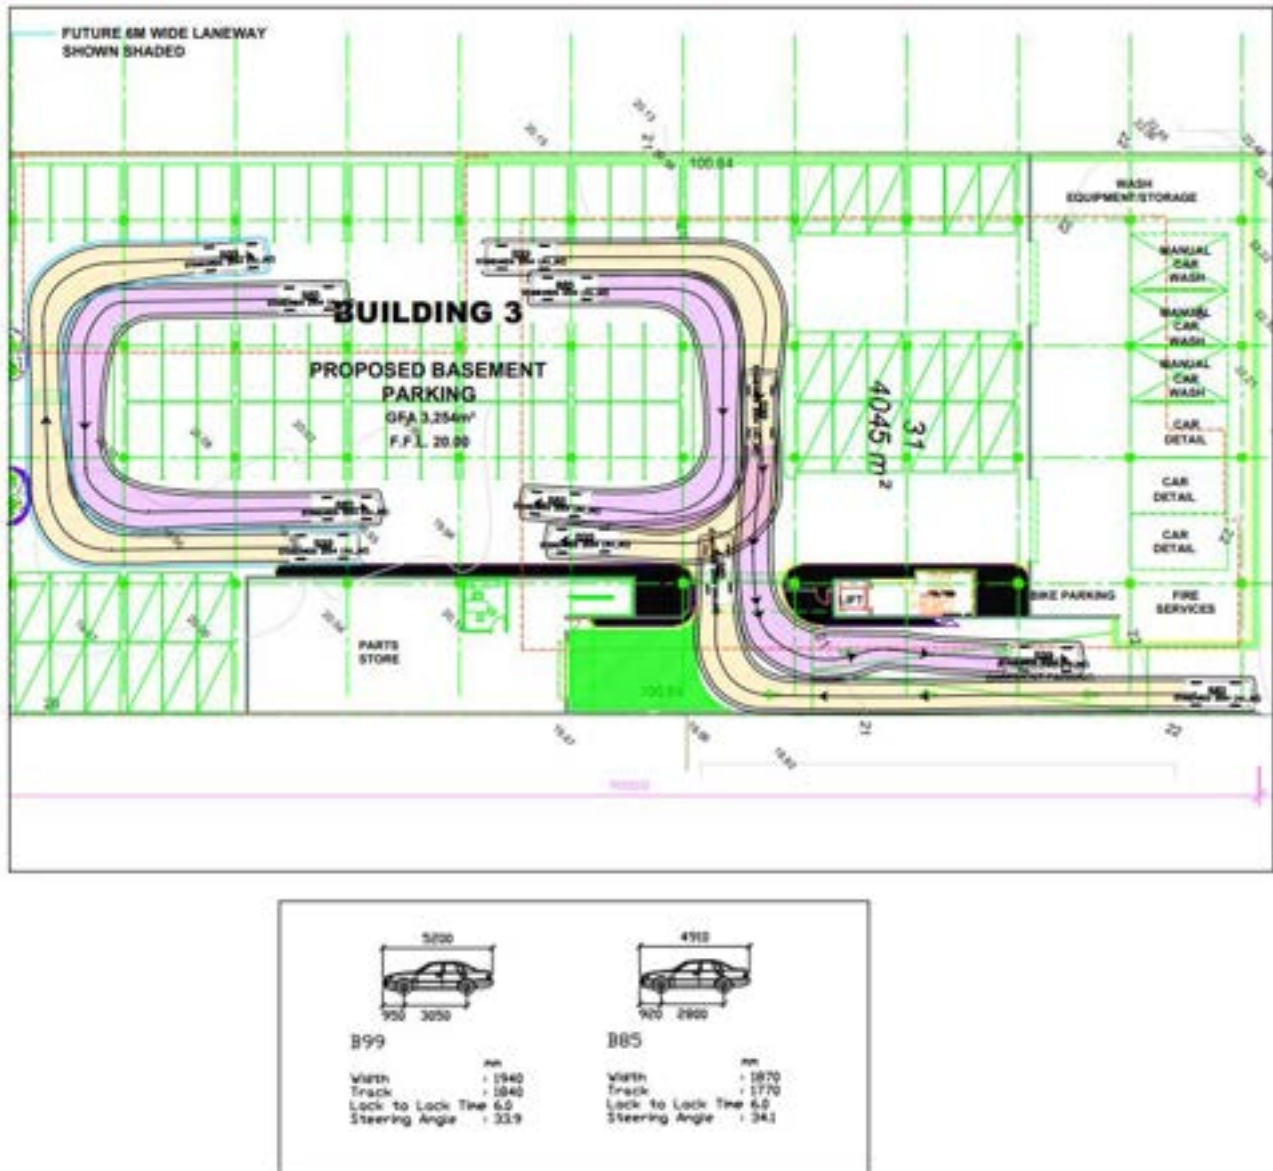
Swept Path – Building 3 Basement Parking Manoeuvre
